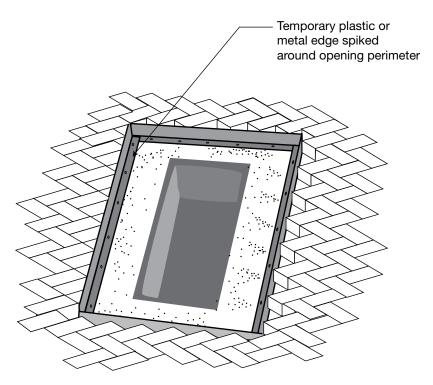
Temporary bracing should be installed along the edges created by the opening in the pavement to ensure the pavers around the perimeter do not move and reduce the size of the opening which would make reinstatement more difficult.
